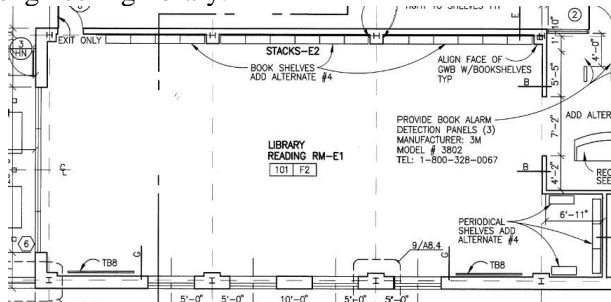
1st Floor Plan View of Schaefer Engineering Library
